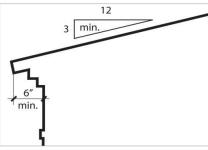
h: Diagram of minimum roof pitch and articulated overhang
